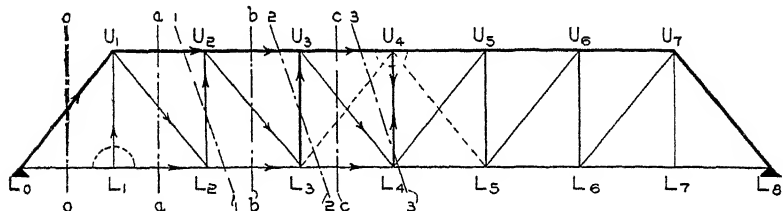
Outline Diagram of 8-Panel Single-Track Pratt Truss Span.
